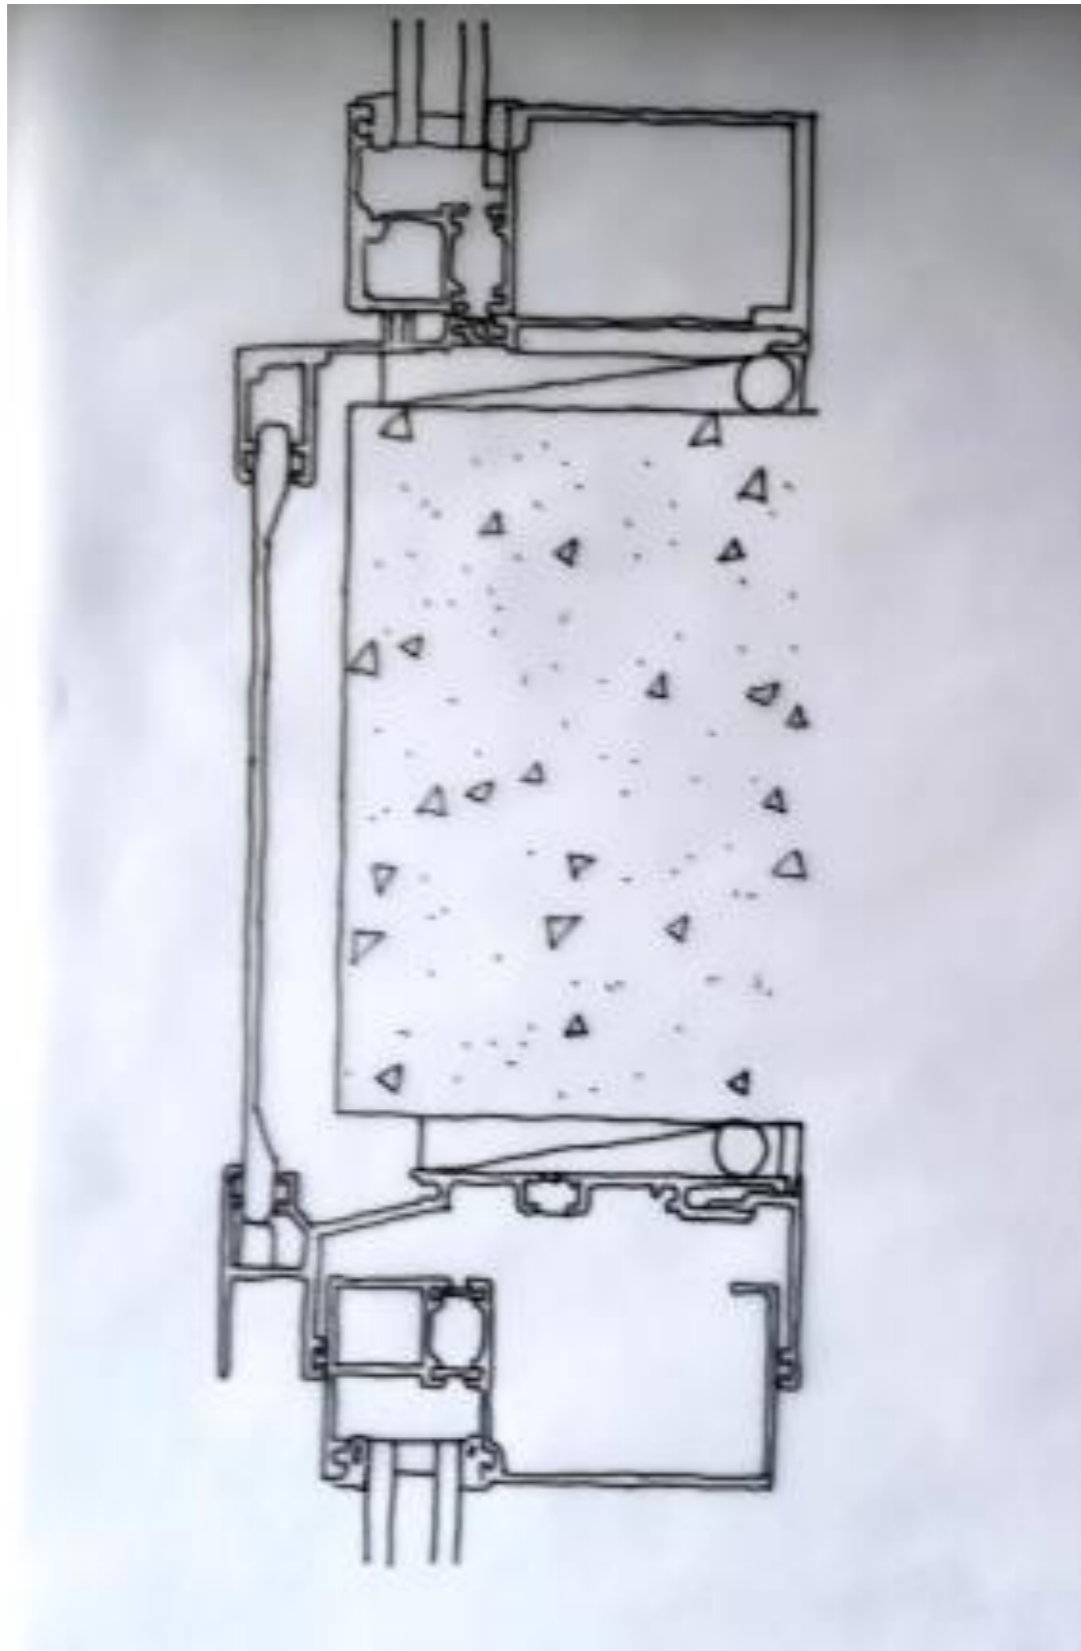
Thermally Broken Capping around Structure Sketch (Author, 2021)
